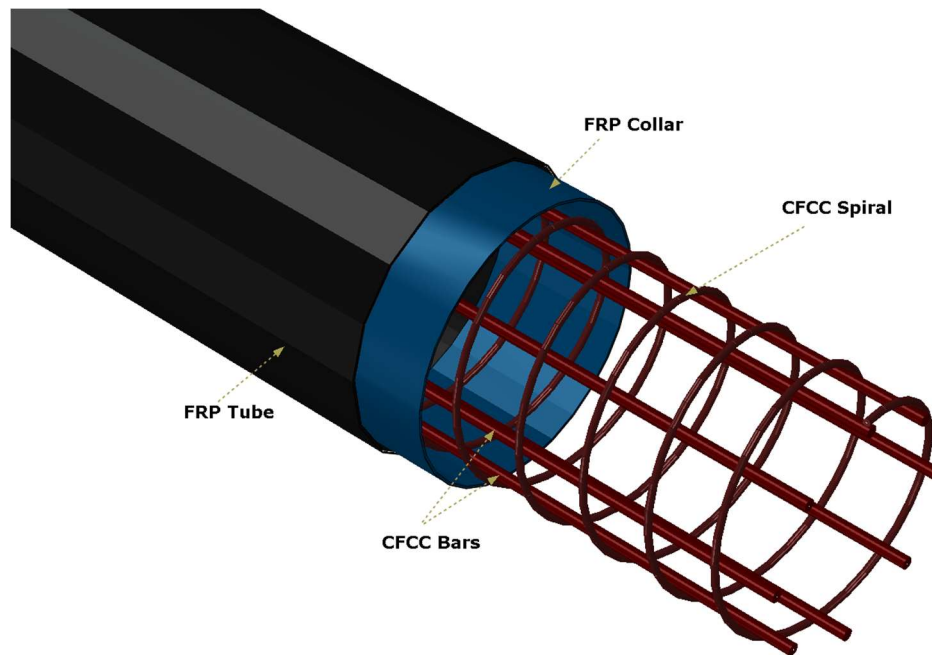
Splice Elements Installed into an FRP Tube Segment
